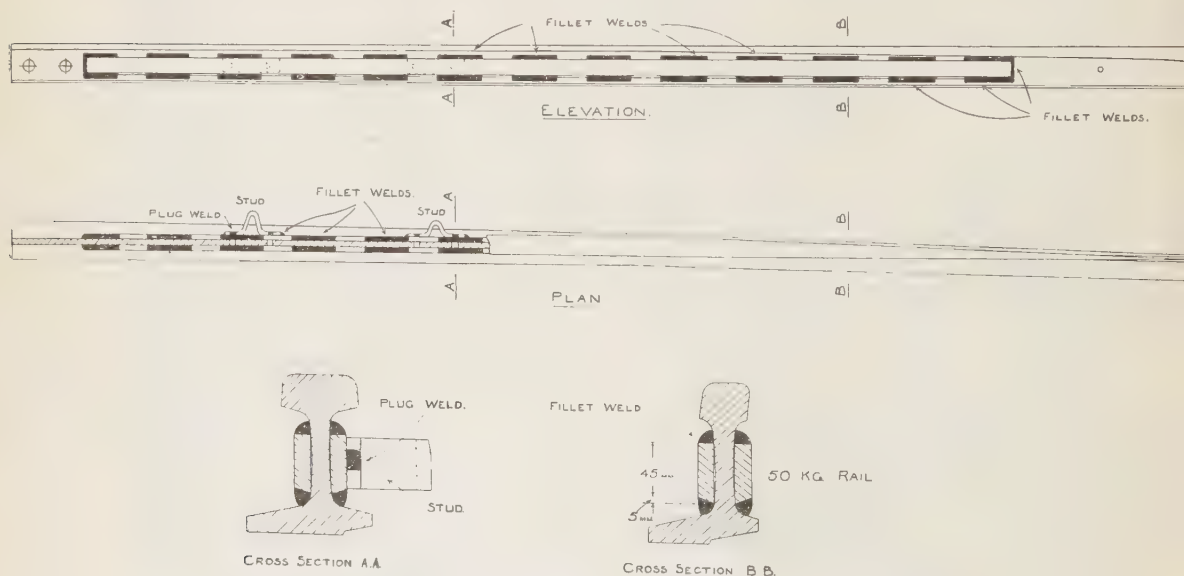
Switch with fillet-welded reinforcing plates. — Japanese Government Railways.
